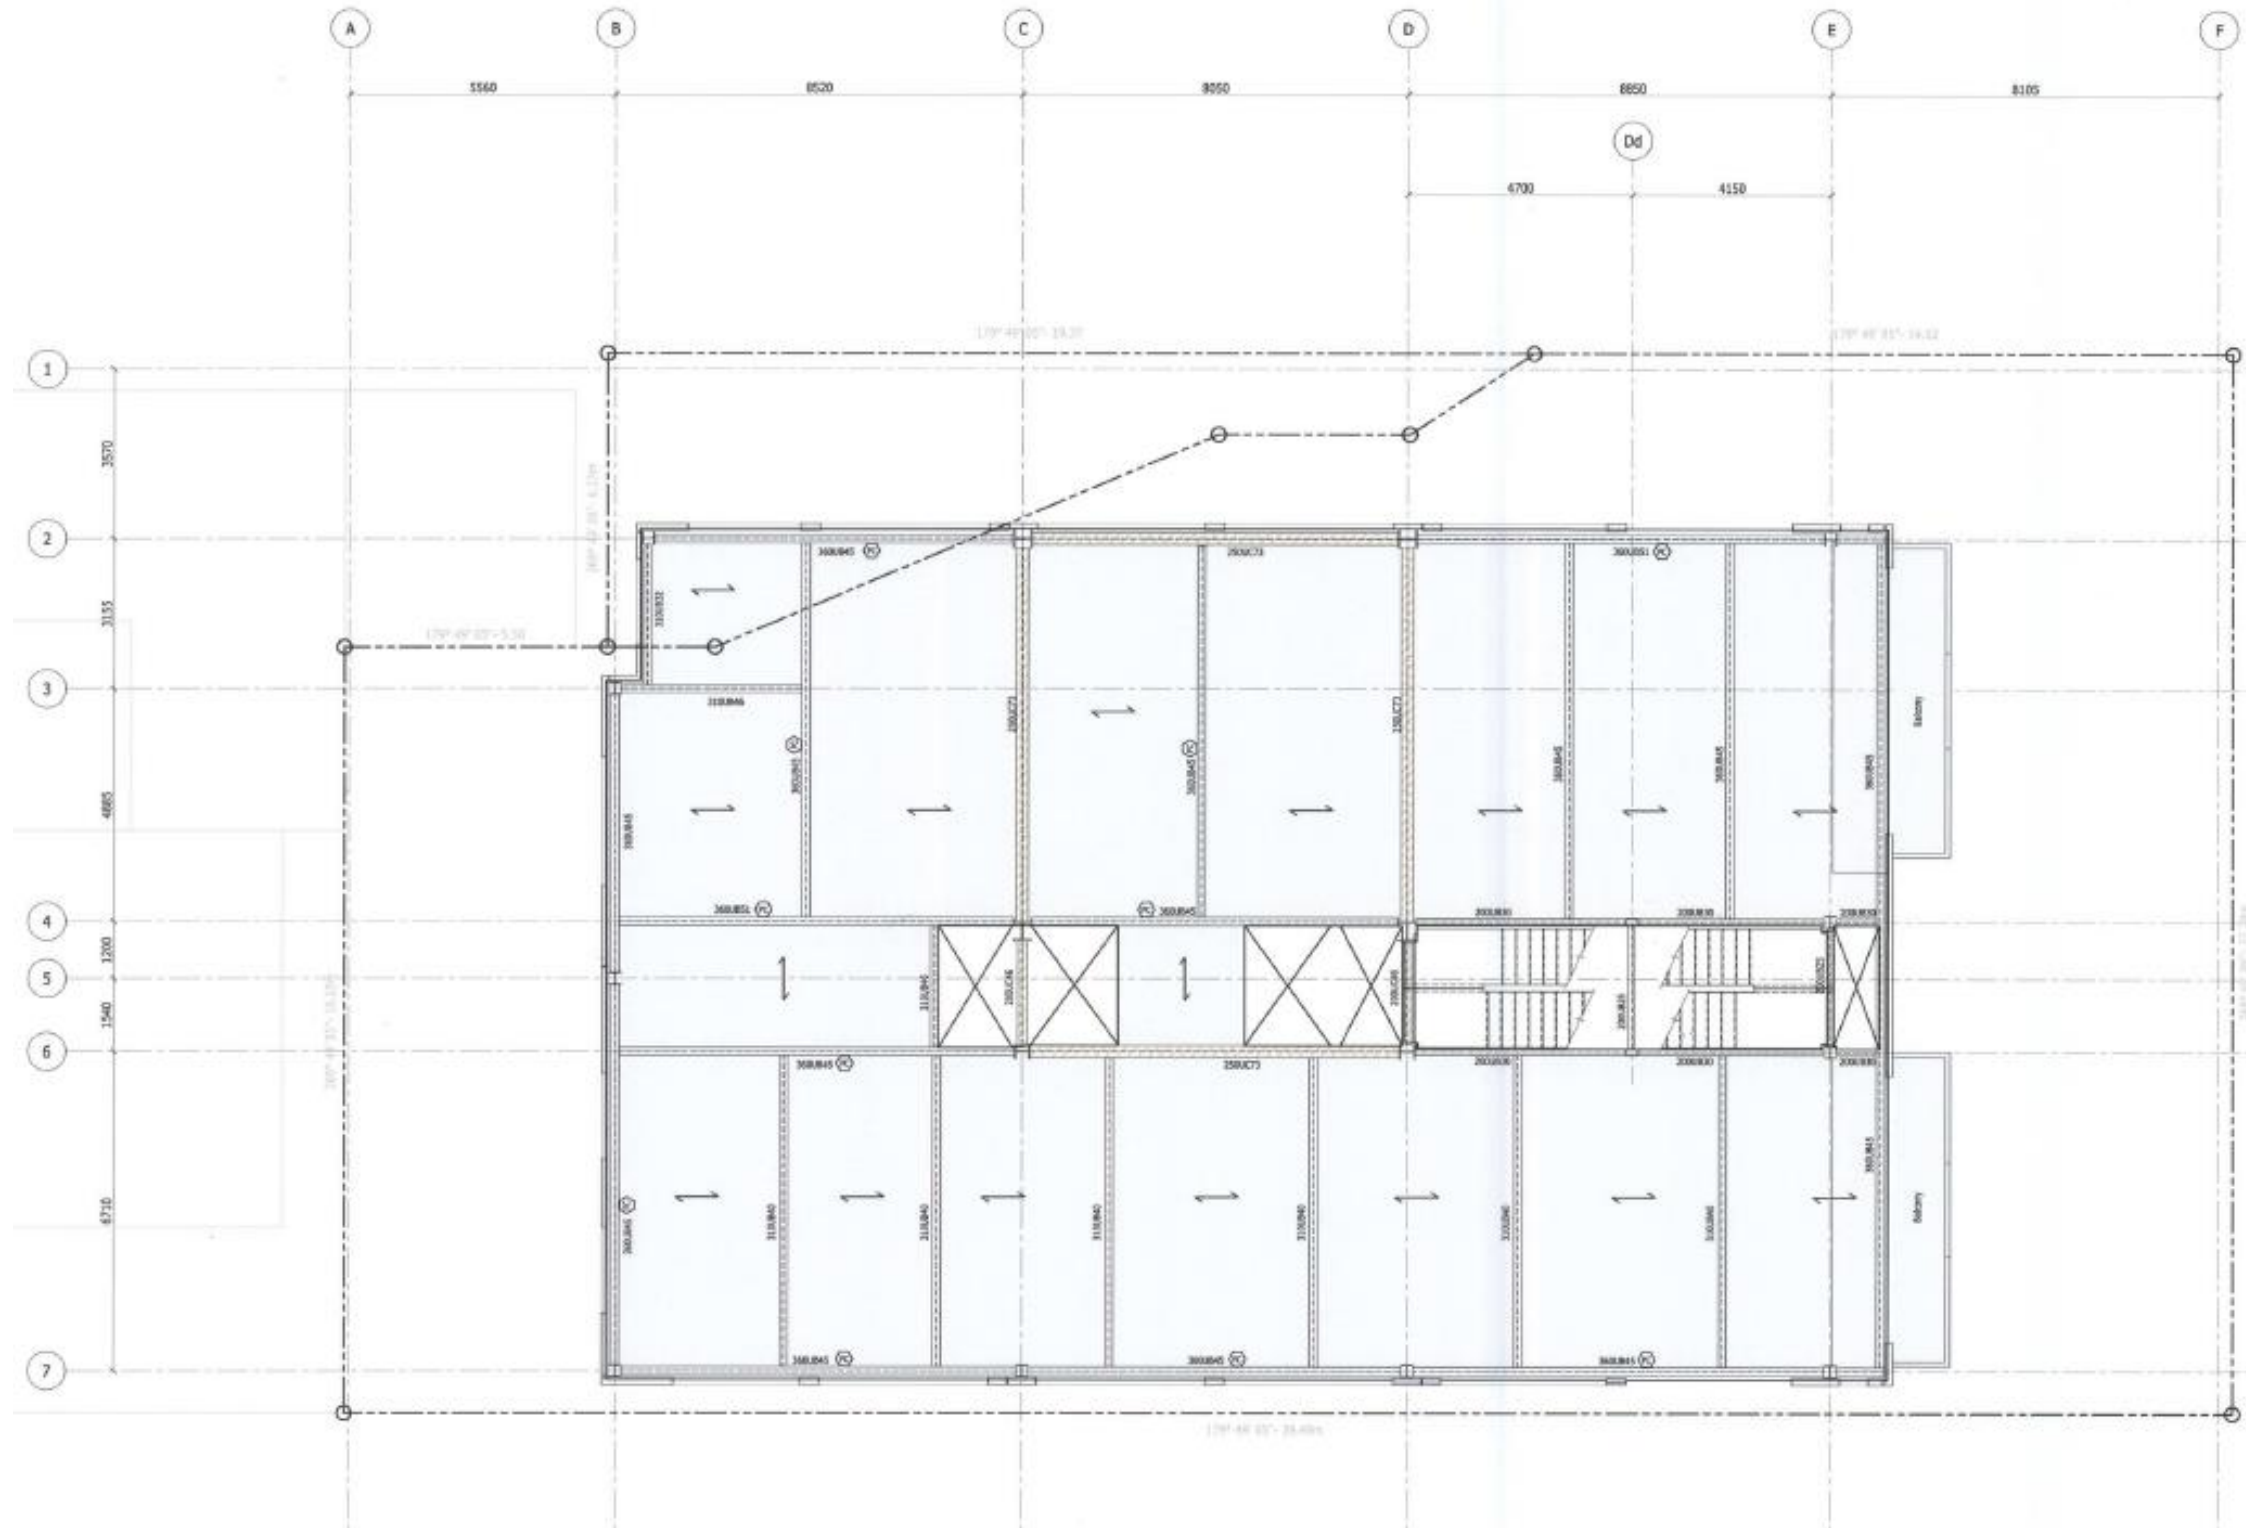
Structural Plan Level 17 (Christchurch City Council 2016c)
